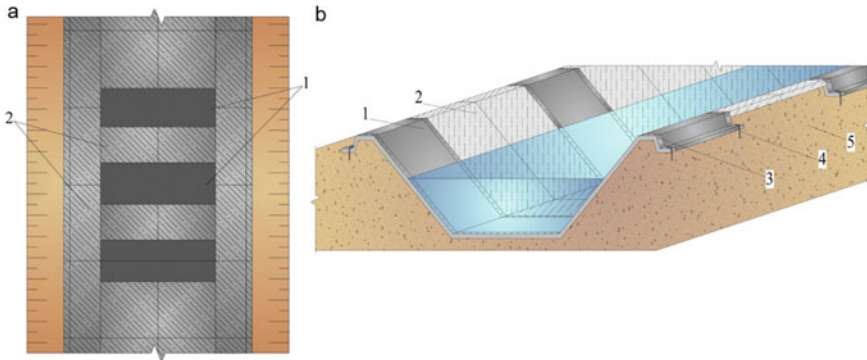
Scheme of repair of major damages of concrete channel linings: a plan; b section 1—concrete cladding; 2—concrete-filled material; 3—bracing (self-tapping screw, dowel-nails); 4—steel stakes; 5—ground of the base
